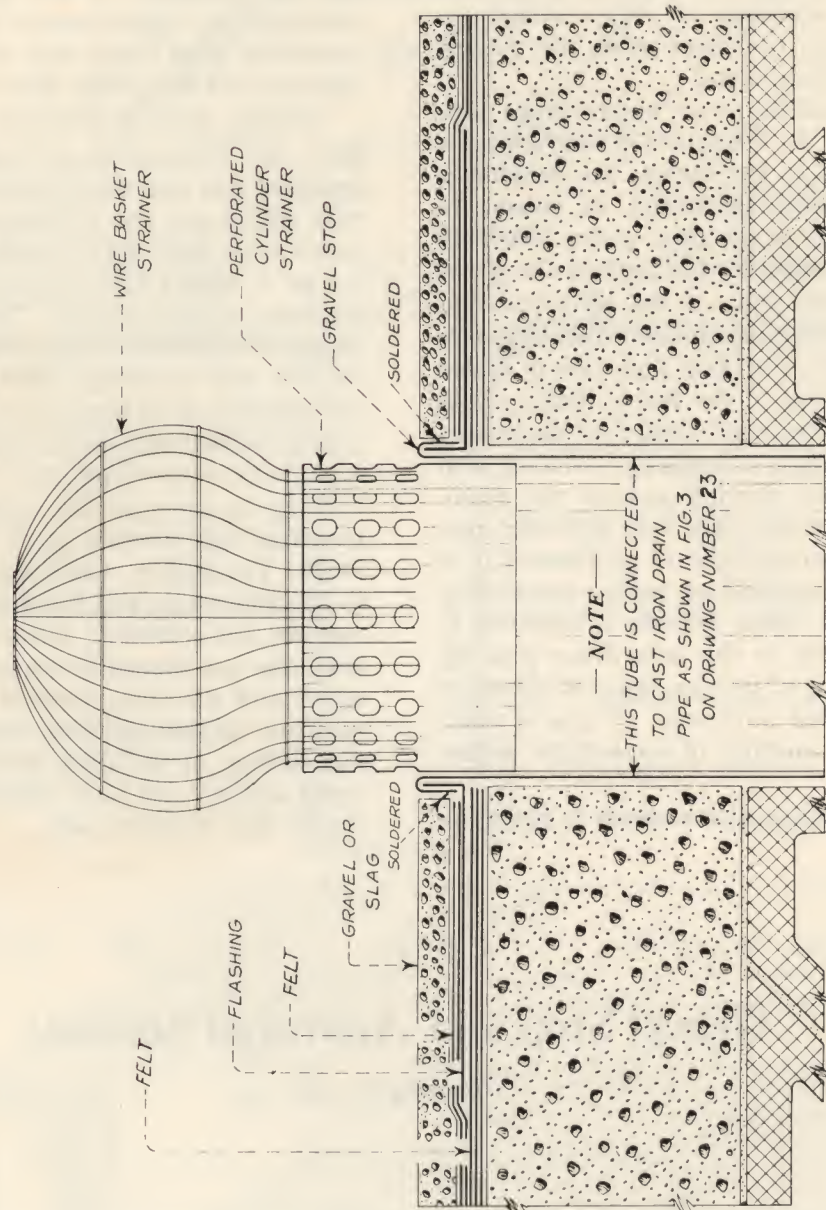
METHOD OF CONSTRUCTING GRAVEL STOP AROUND EXTREME EDGE OF OUTLET TUBE WITH APPROVED STRAINERS
